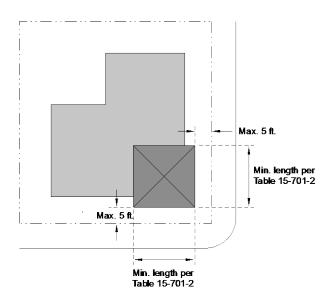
F: CORNER FRONTAGE STANDARDS
